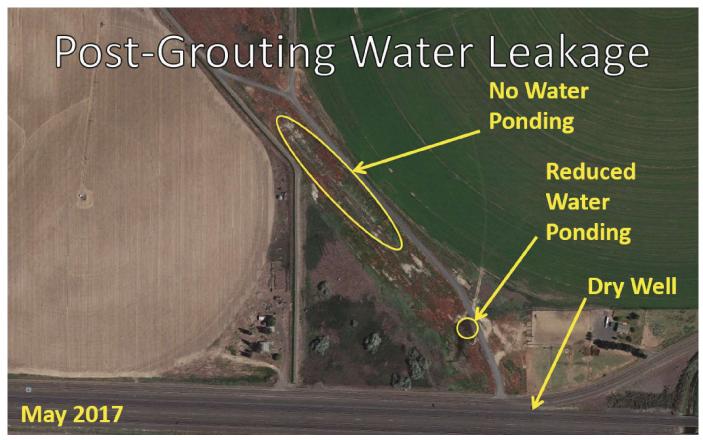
Site conditions after completing Phases 1 and 2 of the repair plan
